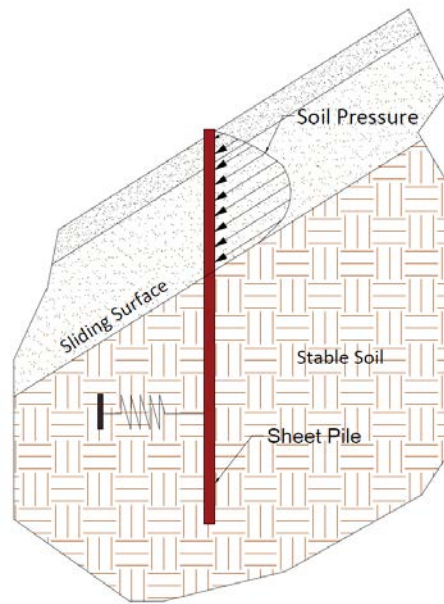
Sheet Pile Slope Stabilization Mechanism
